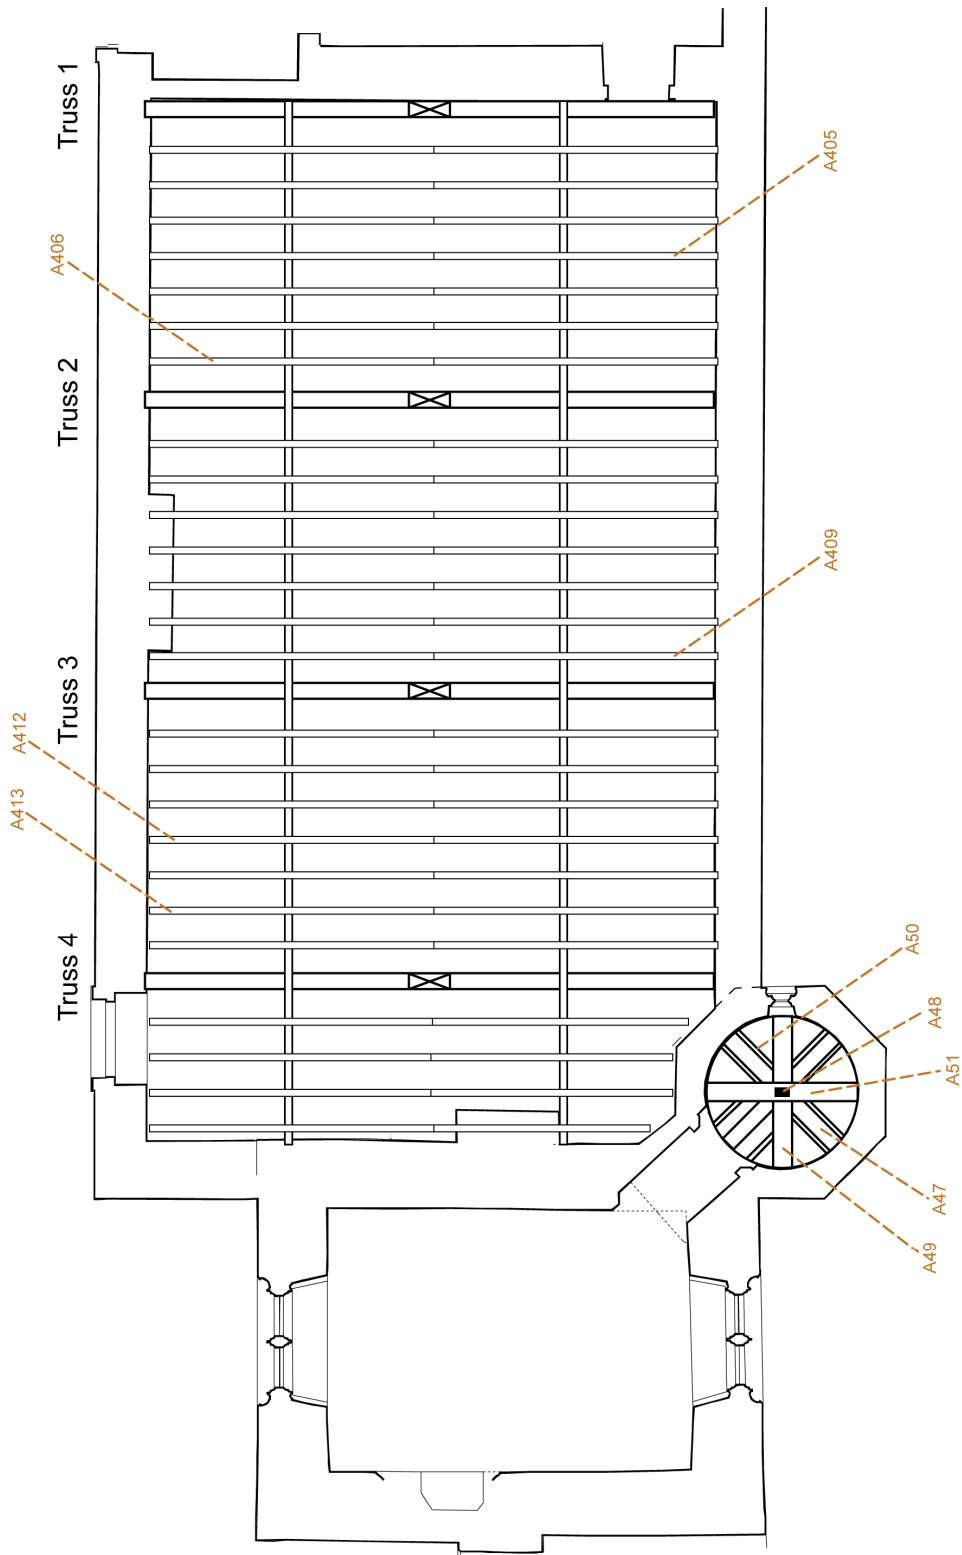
Roof timbers, first-floor rooms at the eastern end of the North range, showing the locations samples APT-A47–51, A405–6, A409, and A412–13
